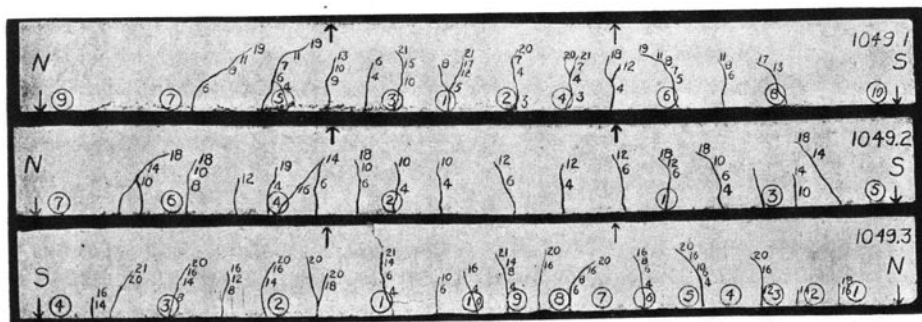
REINFORCED CONCRETE BEAMS AFTER TEST—1911 SERIES.
